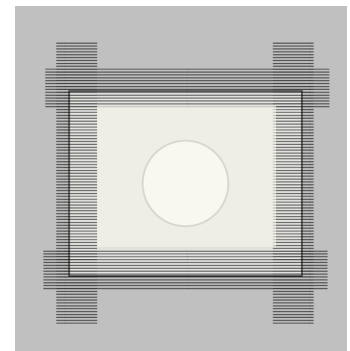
Weep hole example detail - fix min. 300mm size square over a 75mm weep hole using jointing tape
